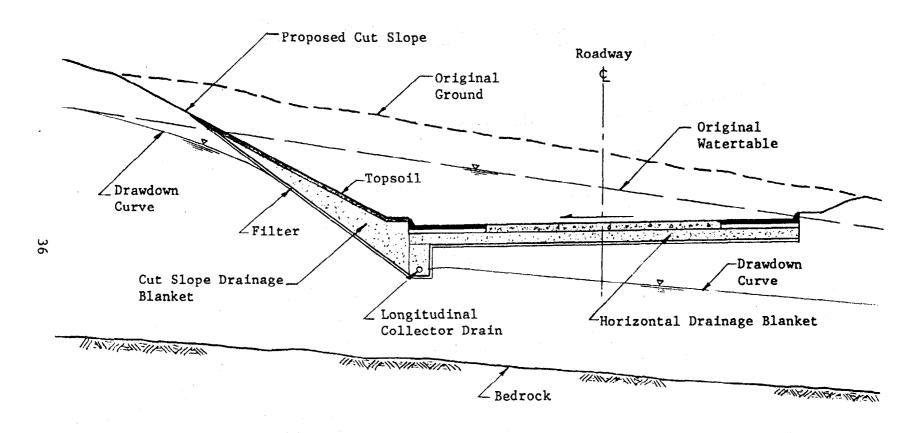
Drainage Blanket (Wedge) On Cut Slope Drained By Longitudinal Collector Drain
